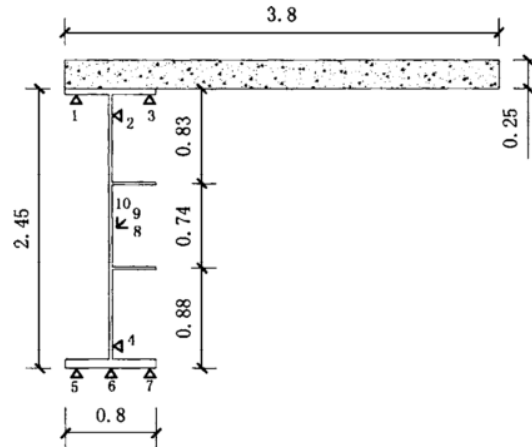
Equivalent section of steel-concrete composite deck at mid-span of Qingzhou Cable Stayed Bridge (units in meters)
